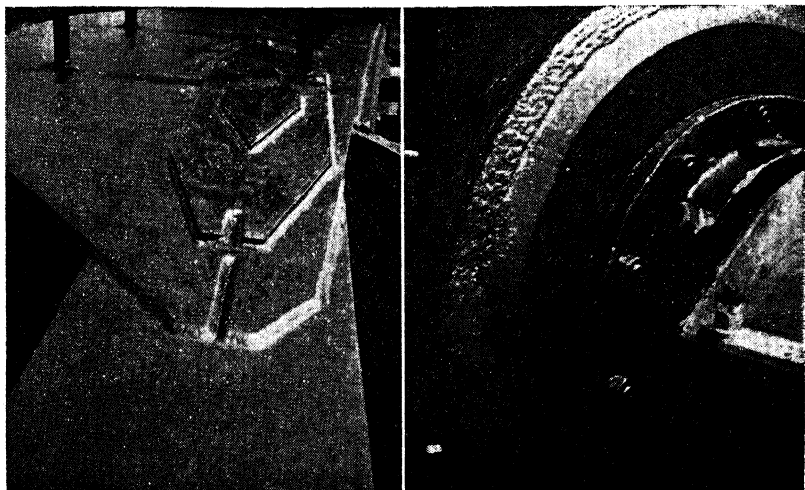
Details of bascule bridge shown in Fig. 1068. Left: Arc welded connection of main girders to bottom counterweight section. Right: Close-up view of arc welded trunnion connection to counterweight box showing beveling of plates and fillet weld.
